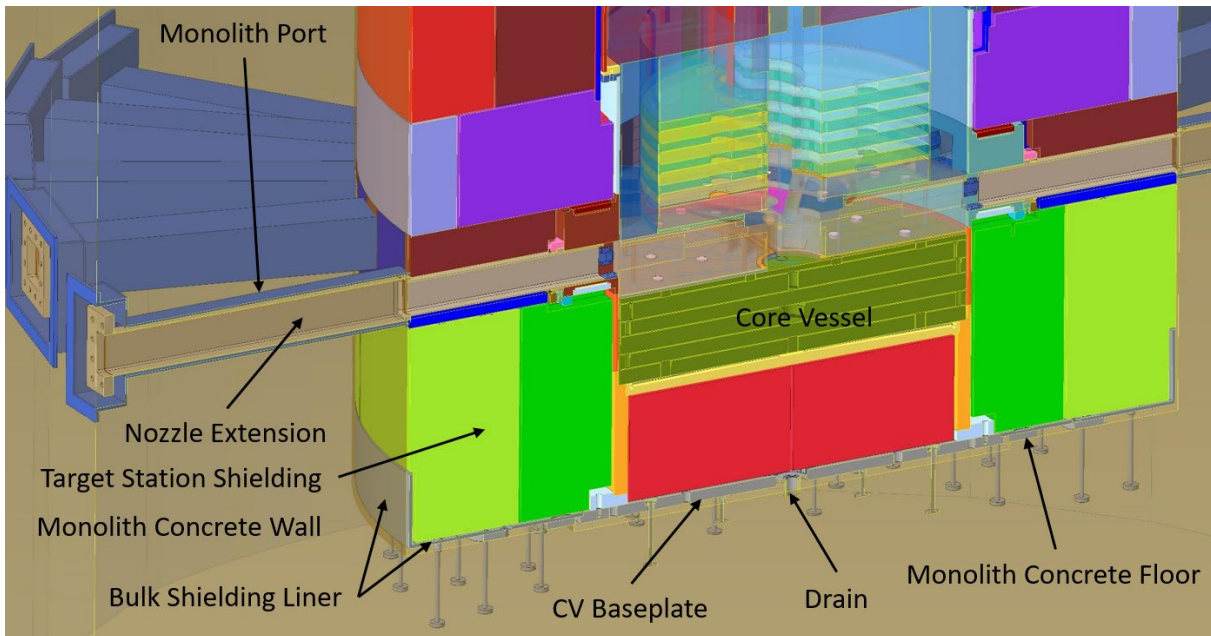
Detailed view of STS Monolith design section cut along Beamline #5
